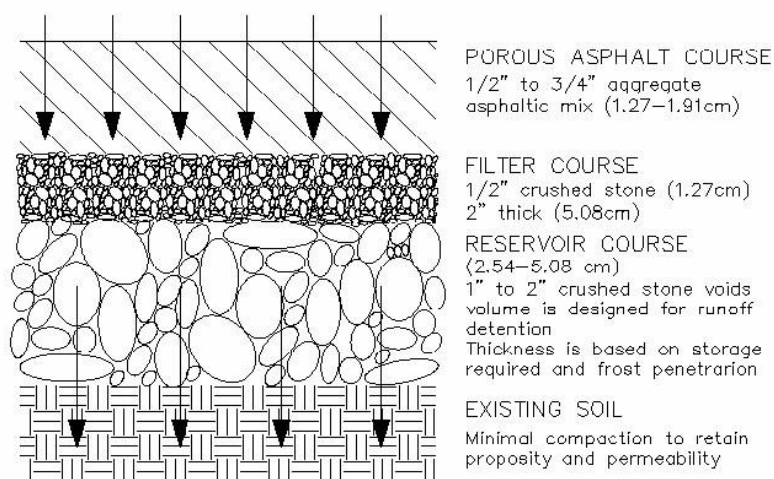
TYPICAL SECTION THROUGH ASPHALT POROUS PAVEMENT
